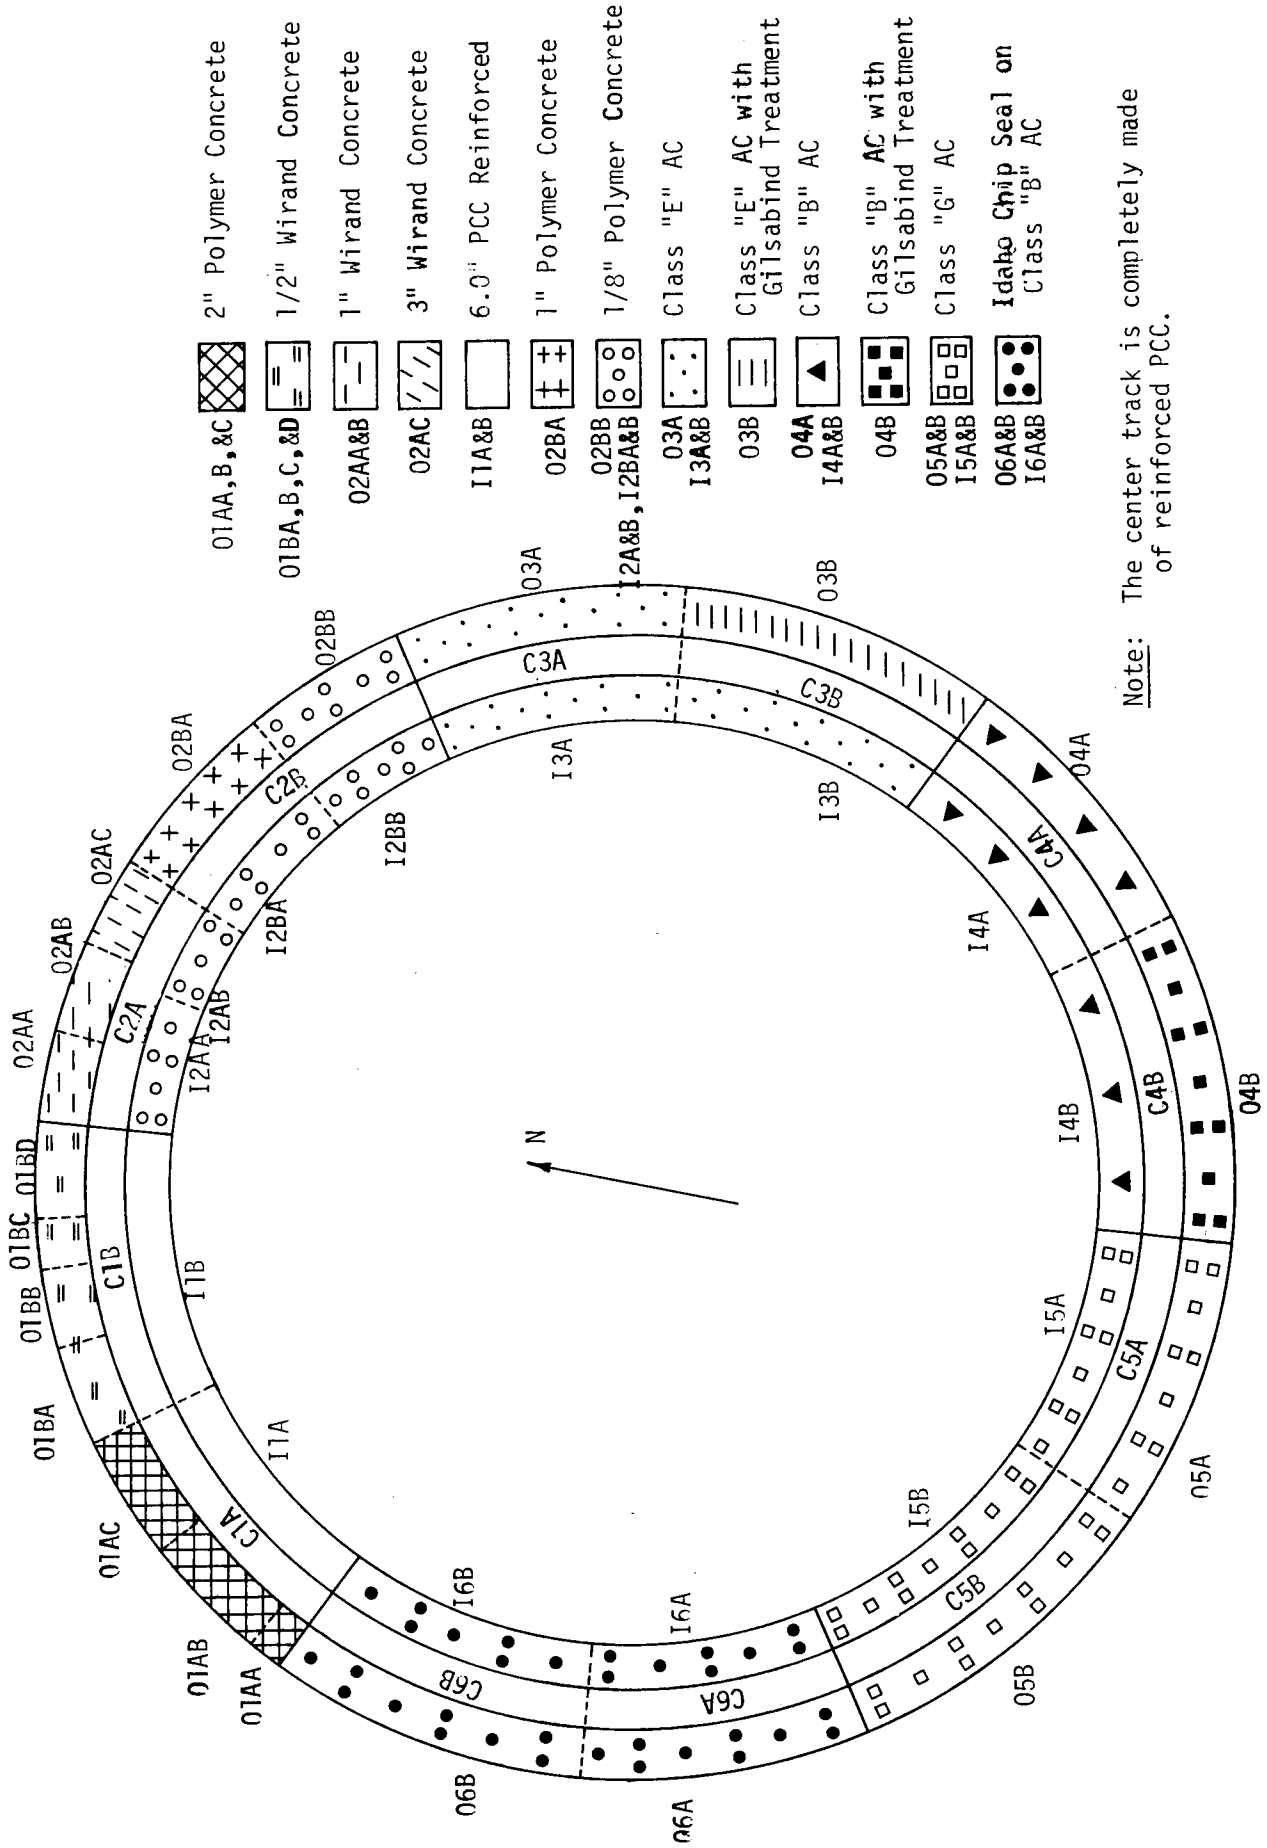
Plan View of the Pavement Sections Tested in Ring No. 5 (Phase I).
